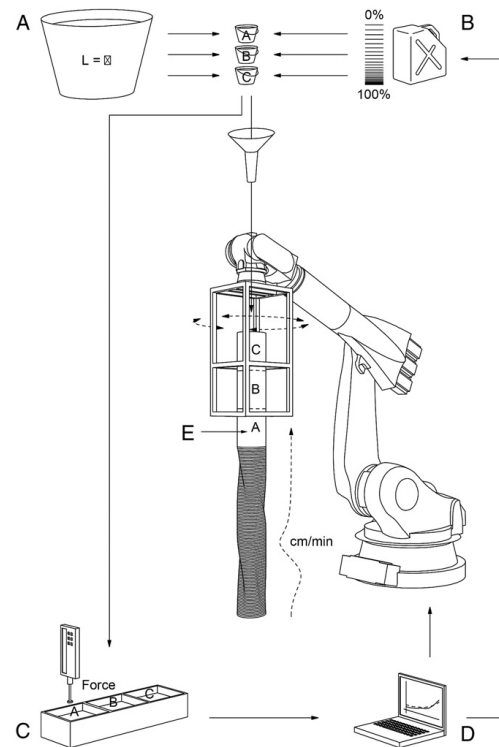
Setup to control concrete hardening for slipforming, in which hardening rates are controlled by incrementally mixing parts of a heavily retarded concrete batch with an accelerator and pouring the resulting concrete into the formwork and monitoring the hardening rate offline using penetration measurements as input for robotic feedback[33].
